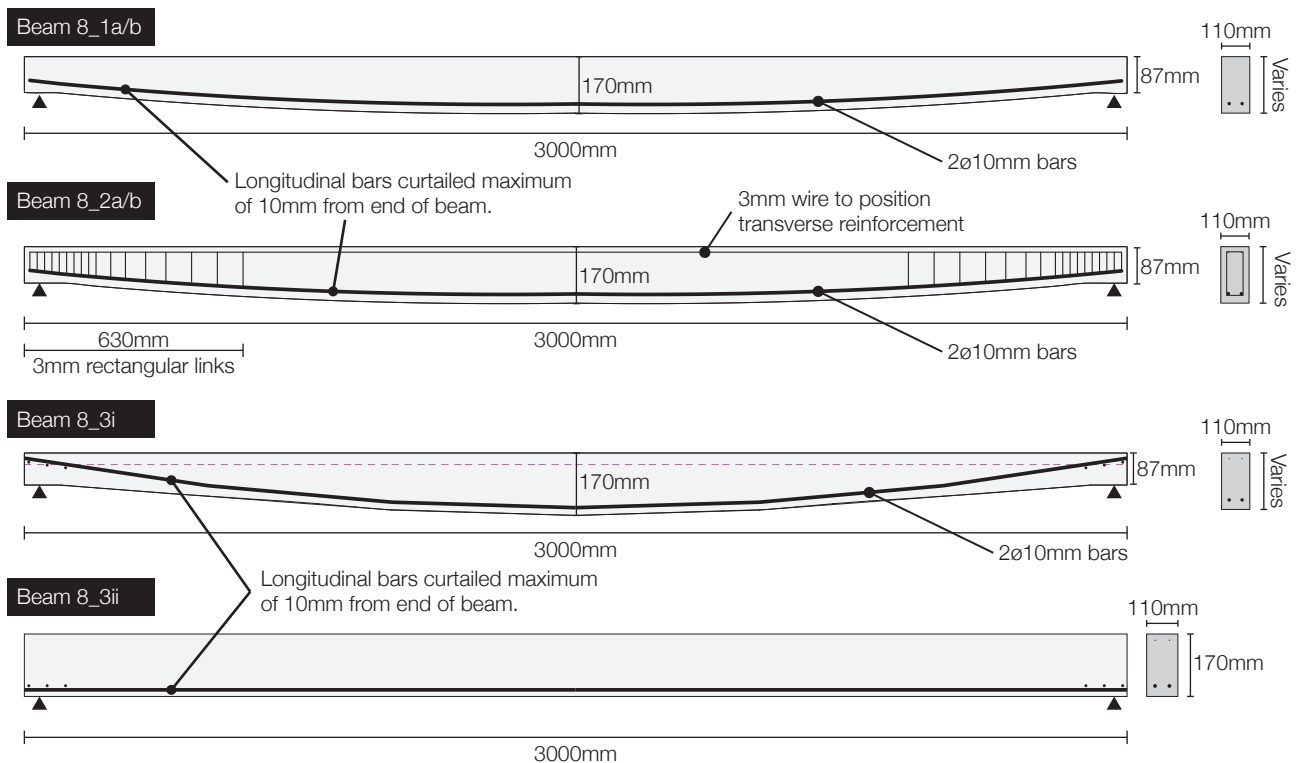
Beams 8\_1 - 8\_3 as tested.
